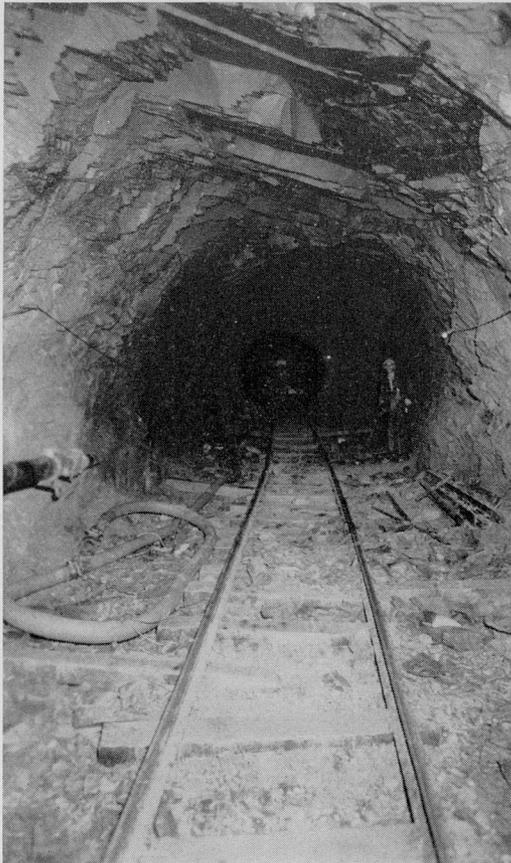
LOOKING SOUTHERLY, SHOWING GUNITED SECTION OF UNLINED TUNNEL AT BULKHEADED END OF CONCRETE TUNNEL LINING PLACED UNDER CONTRACT 115, CITY TUNNEL EXTENSION, CONTRACT 193, SEPTEMBER 12, 1955.
